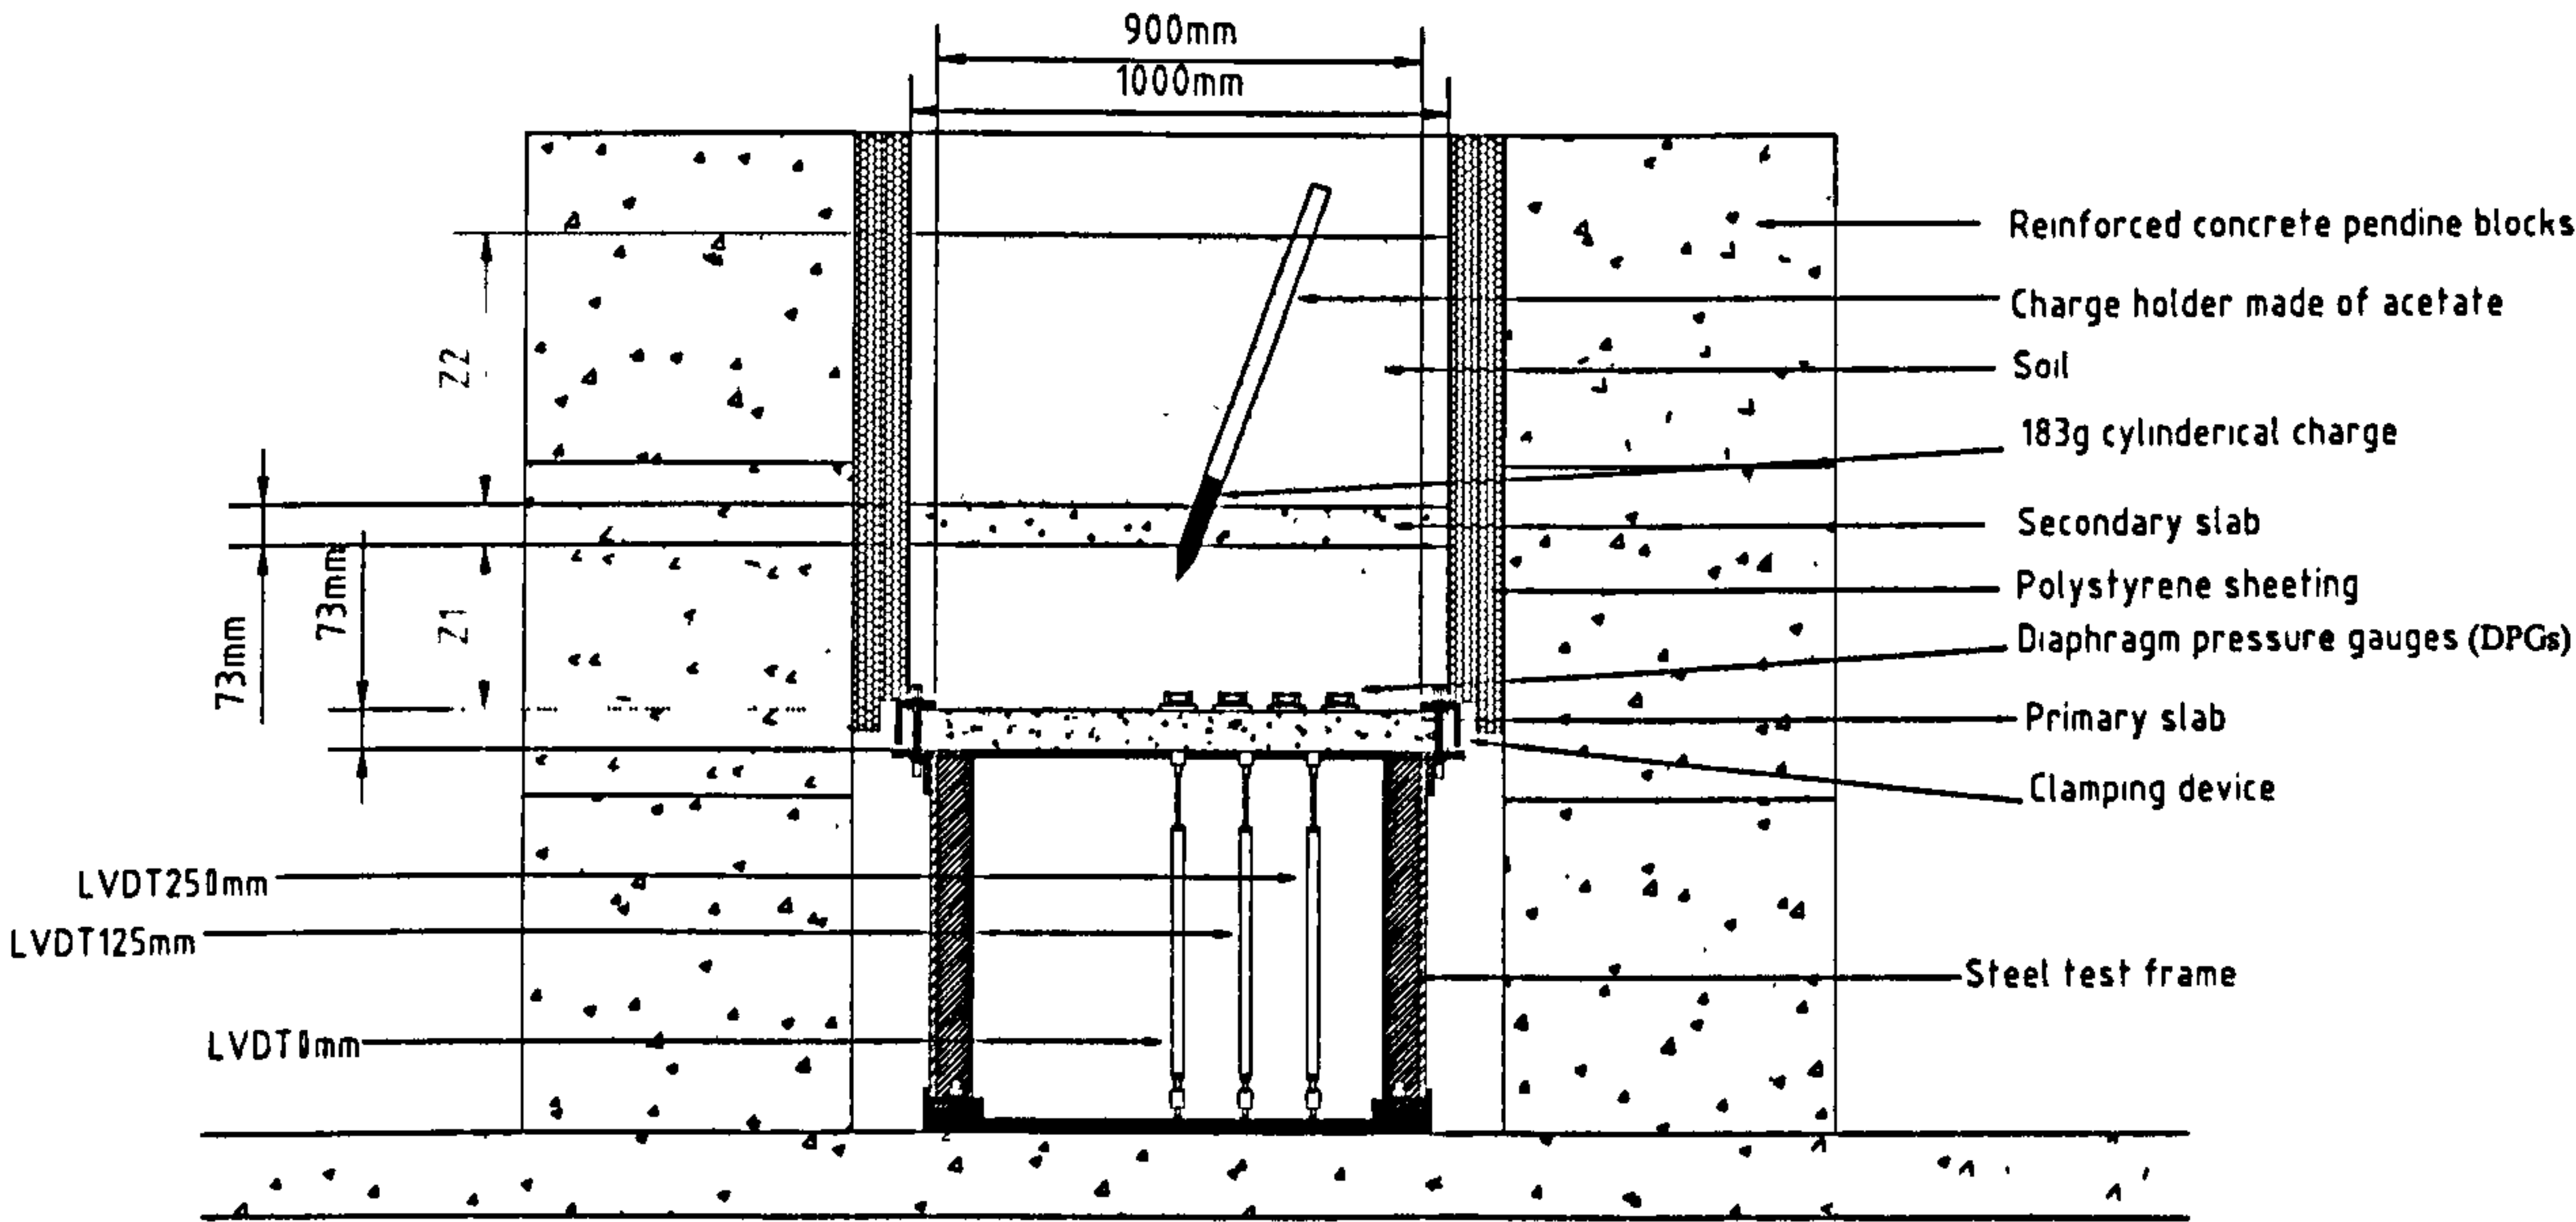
Cross-sectional elevation of a steel test set up within the test cell
